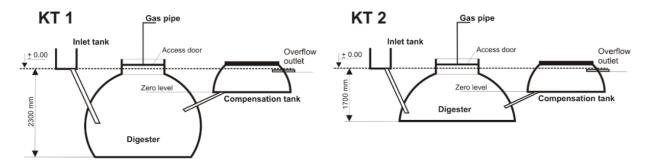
Small-scale biogas plant illustration - fixed dome model varieties (KT 1 and KT 2) Source: Roubík et al. (2018)
